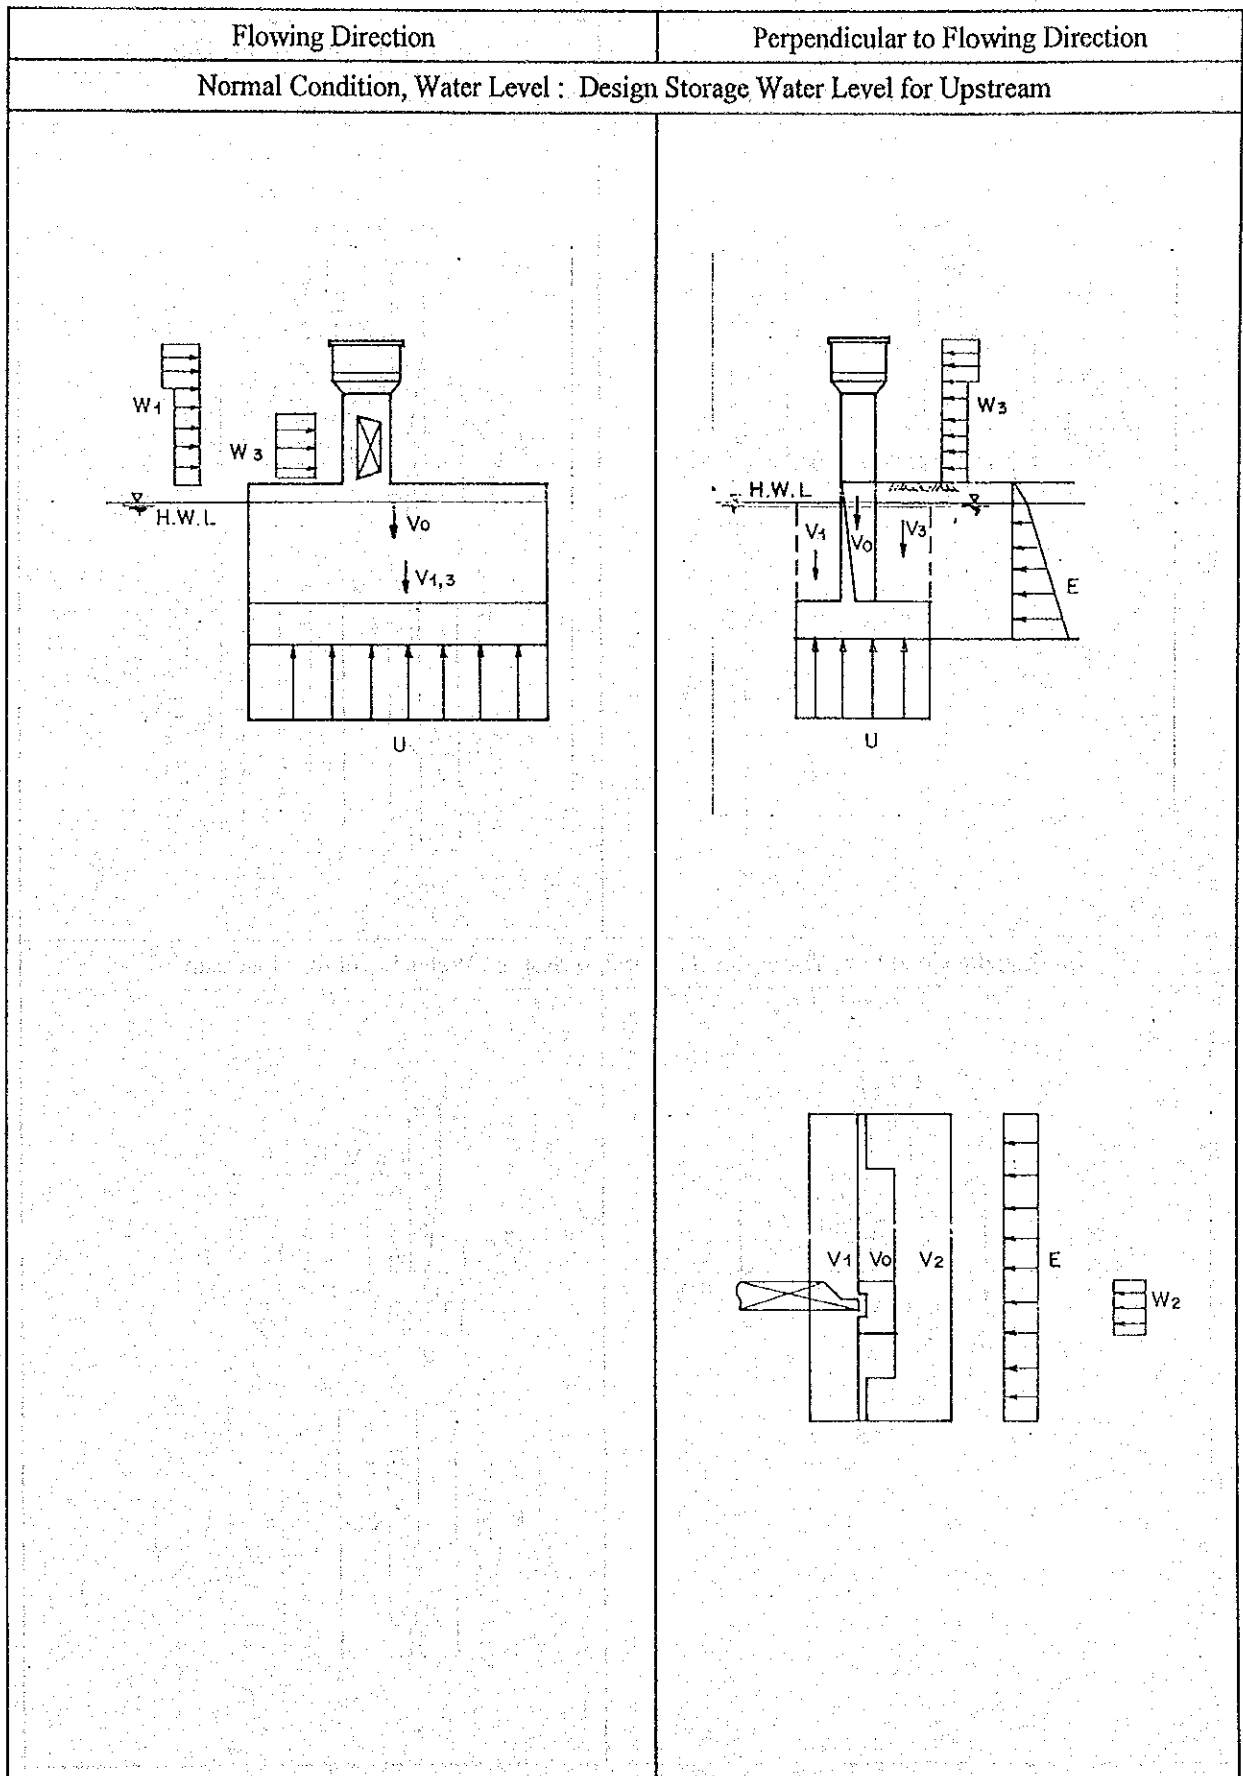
(2/4) Loading Conditions for Side Piers of Weir
